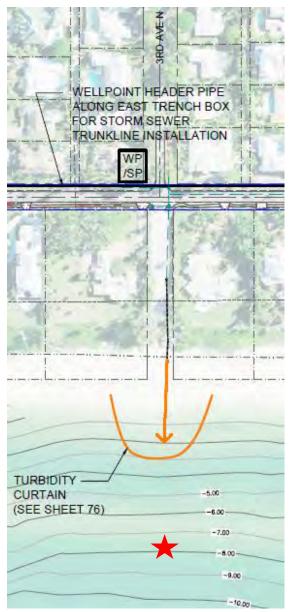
Background Sampling Location (Typical) (Excerpt from Sheet 65 of Construction Drawings)
